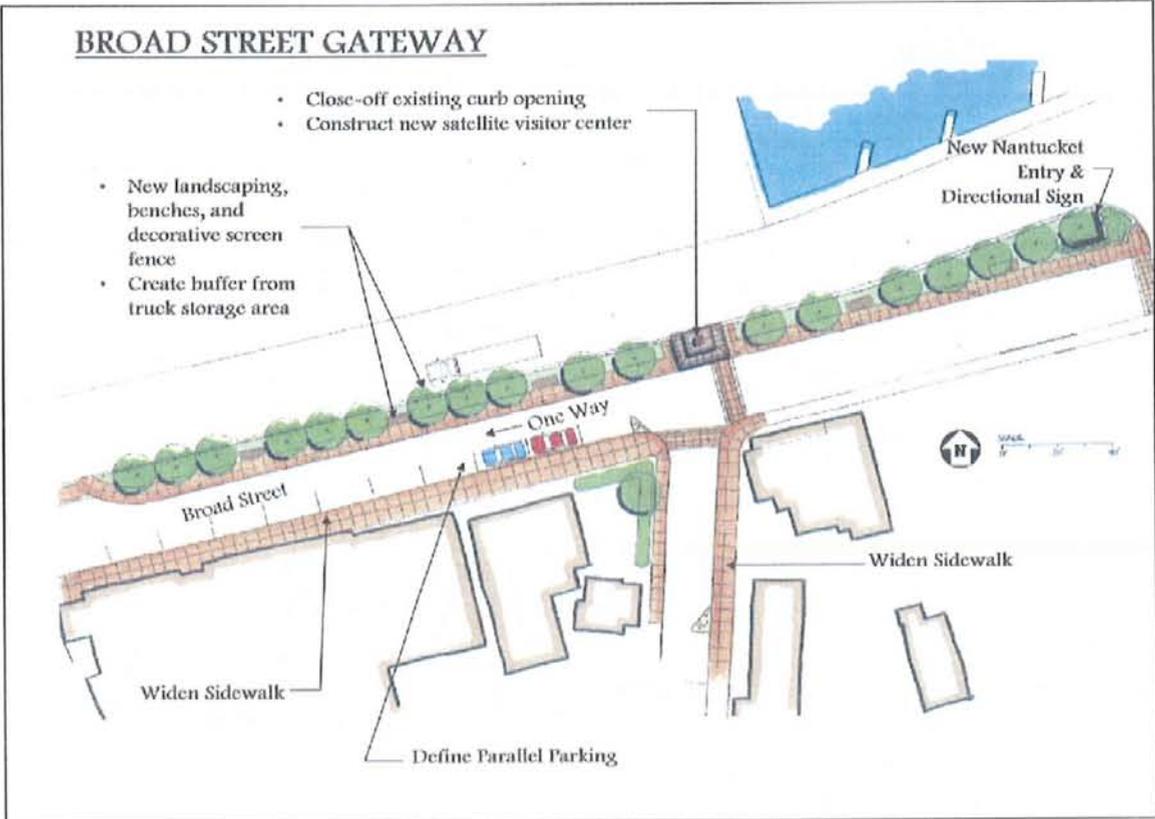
Conceptual schematic site plan depicting potential lower Broad Street streetscape improvements and gateway.
